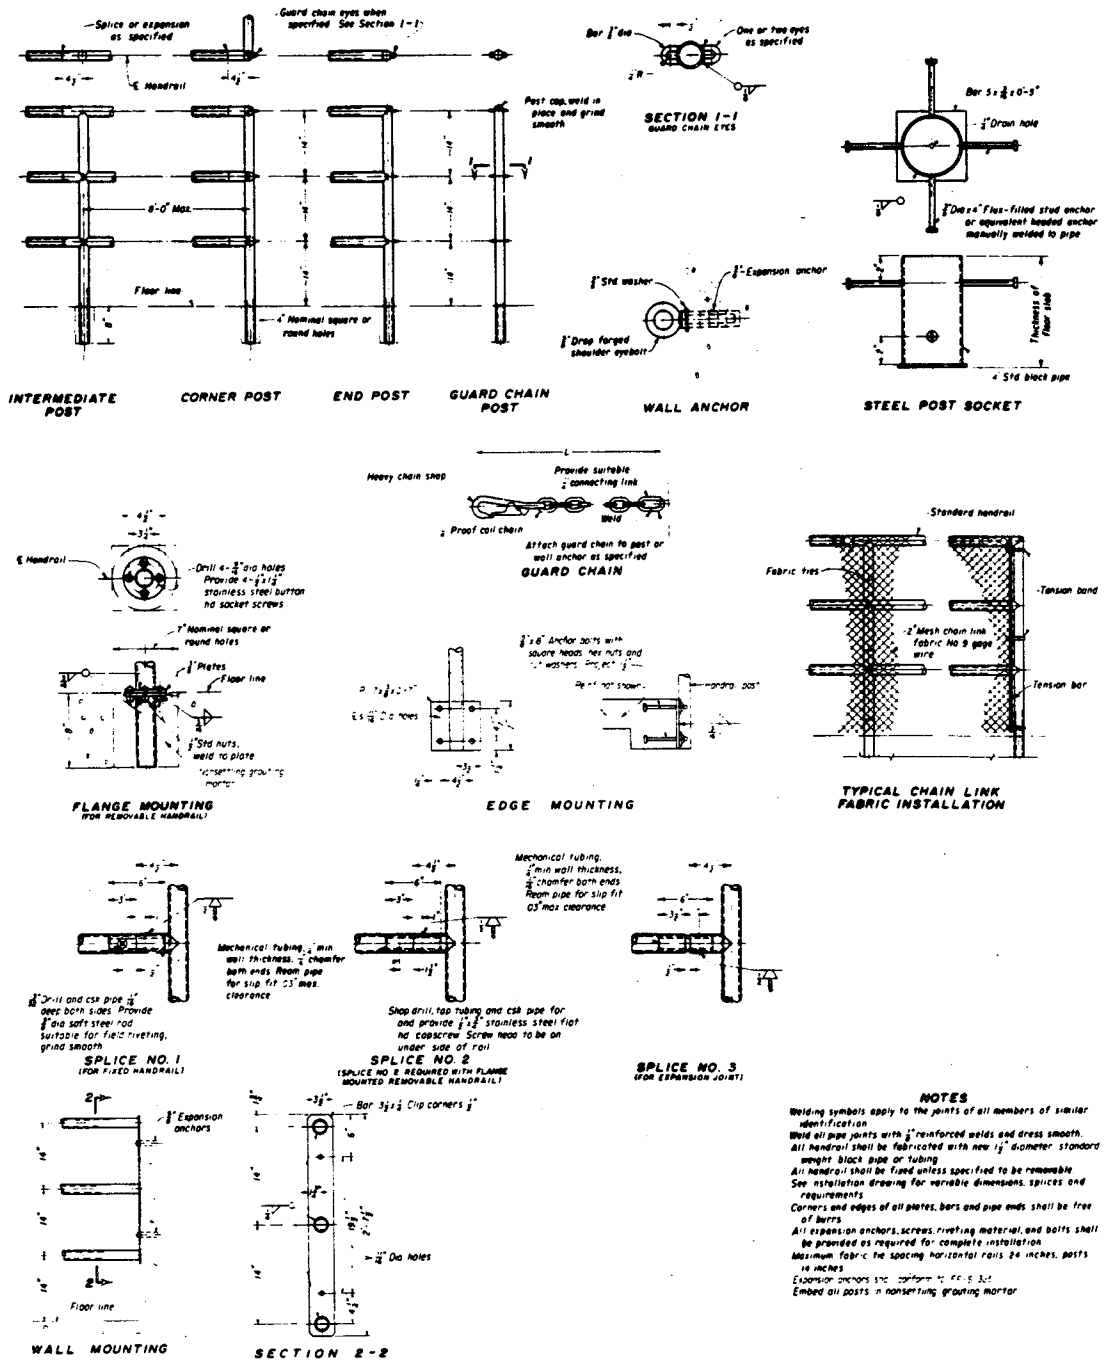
Three-rail handrail—42 inches high. 103-D-1203
